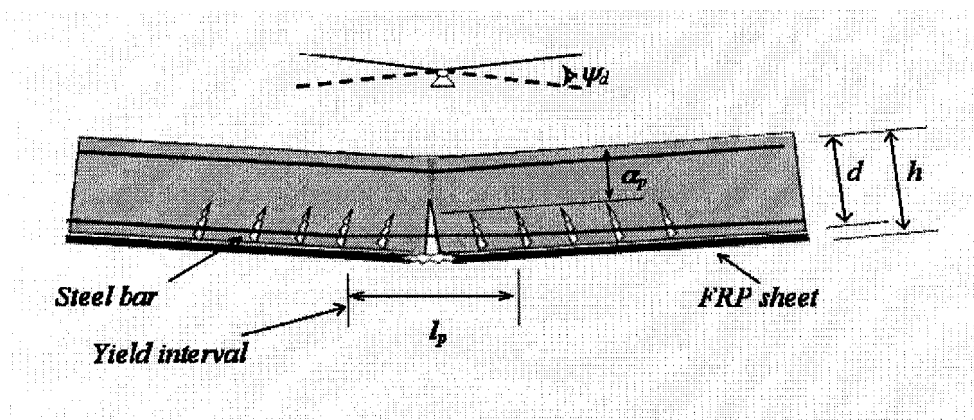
Cracked cross-section after tensile steel bars have yielded
